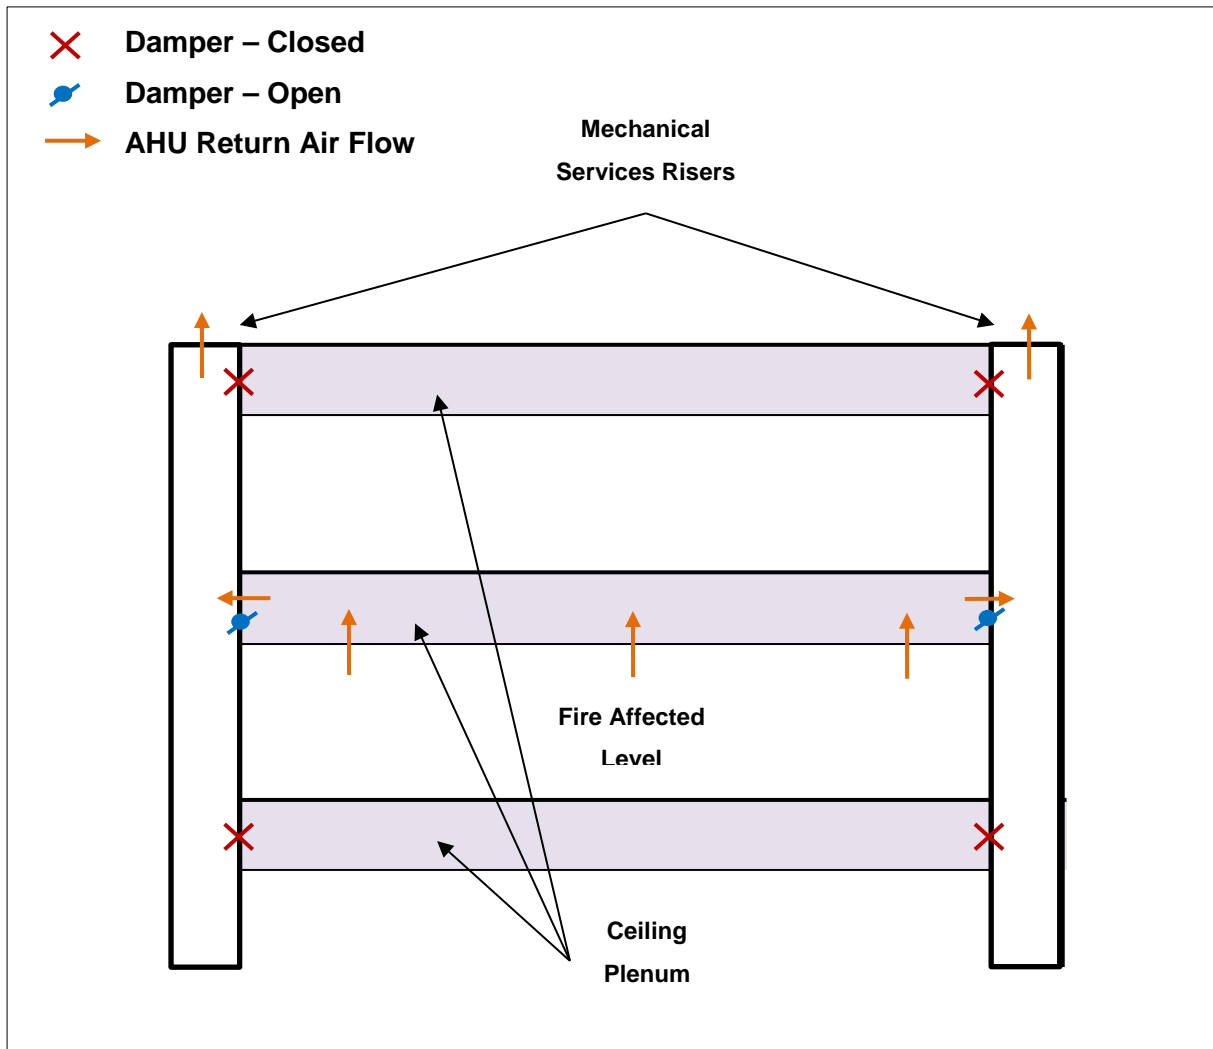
Smoke Exhaust Schematic – Original Construction (elevation)
